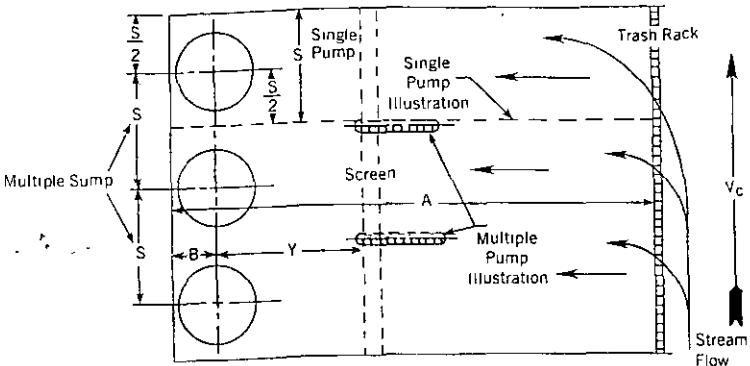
SUMP DIMENSIONS PLAN VIEW
